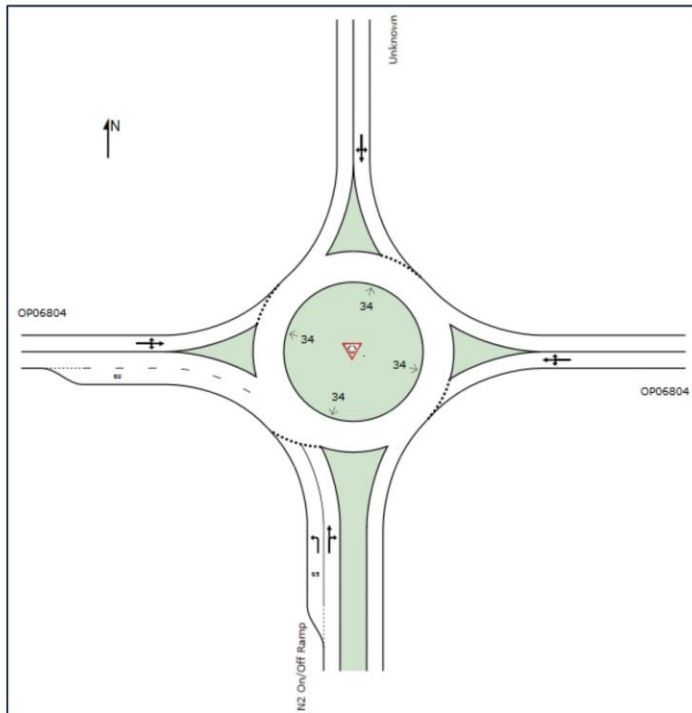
OP06804 and National Route 2 Southbound Carriageway Ramp Terminal Existing Intersection
